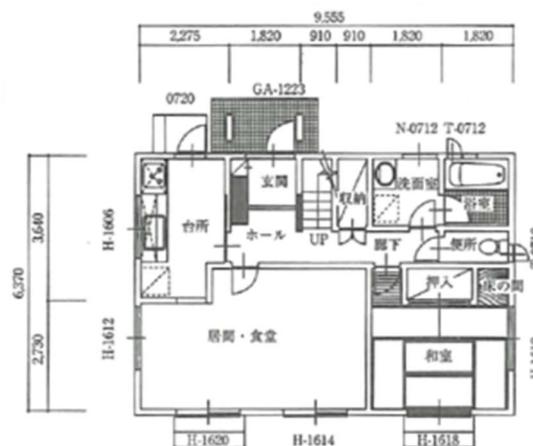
The 1st floor plan of model house (IBEC, 2002)
